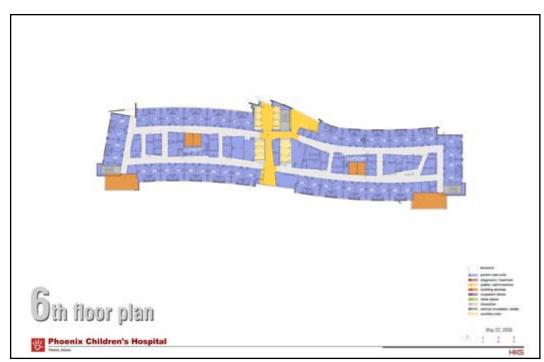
22 Sixth Floor Plan, Phoenix Children's Hospital
